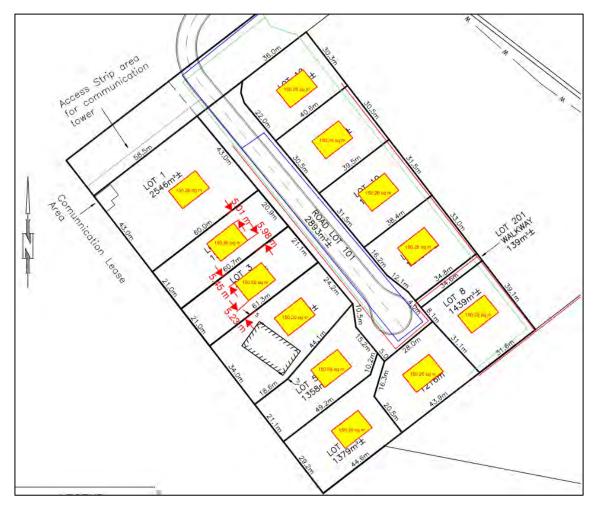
Excerpt of the submitted Plan of Subdivision which shows each lot containing a building area required by Acceptable Solution 10.6.1 A1(a)(i) and (ii).
